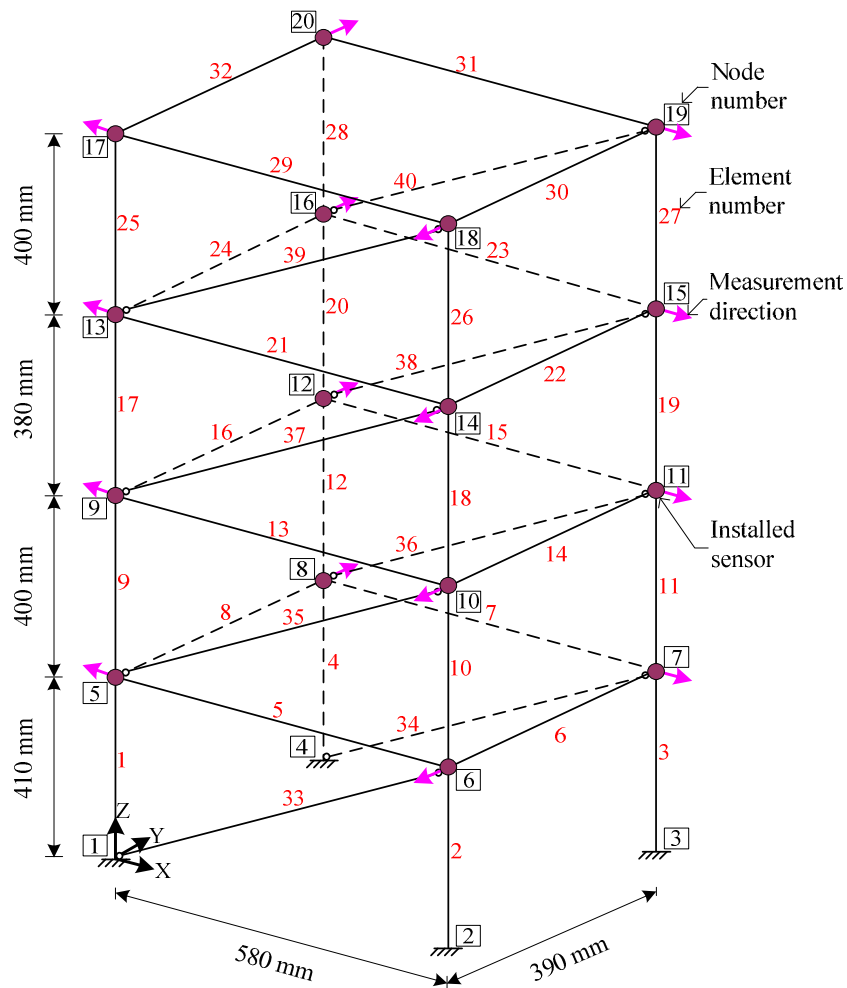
The finite element model of the laboratory tested space steel frame model structure with sixteen installed sensors
